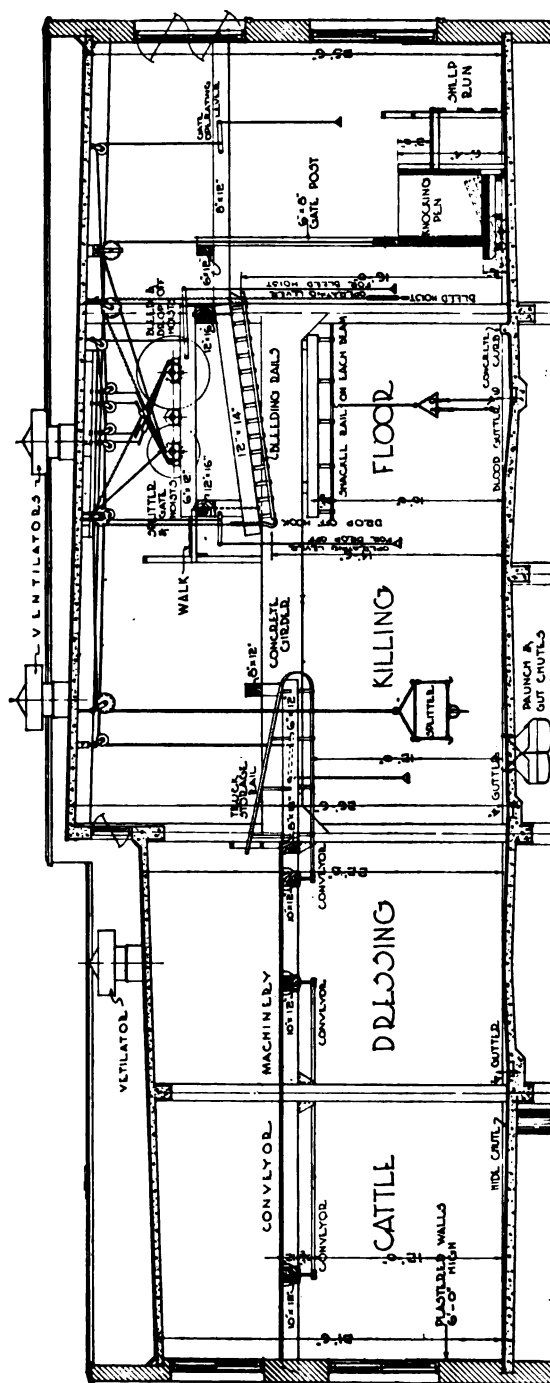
SECTION THROUGH BEEF KILLING FLOOR.
